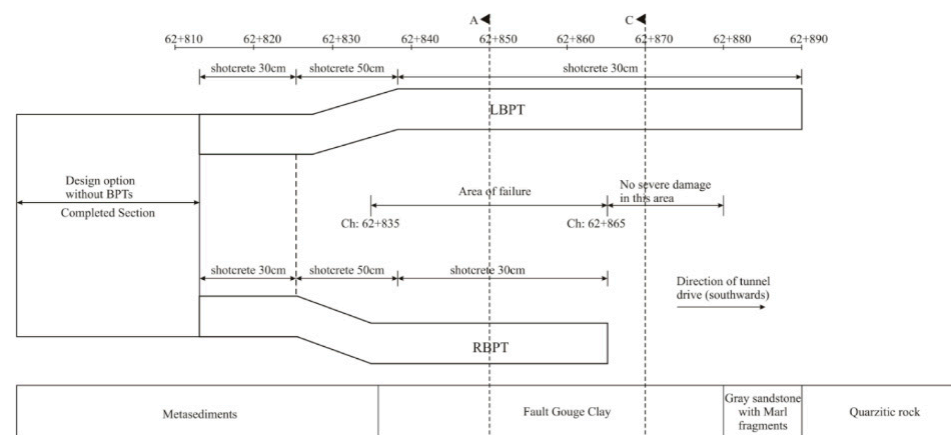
Plan view of the Asarsuyu left drive showing the main tunnel and the two bench pilot tunnels under construction at the time of the earthquake [8].
